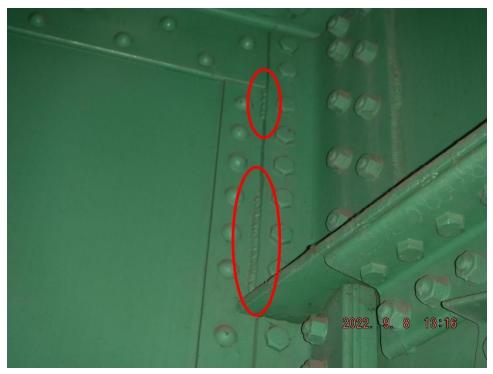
Example of tack welds on girder (North Girder, Span 2 at Pier 3 shown)
